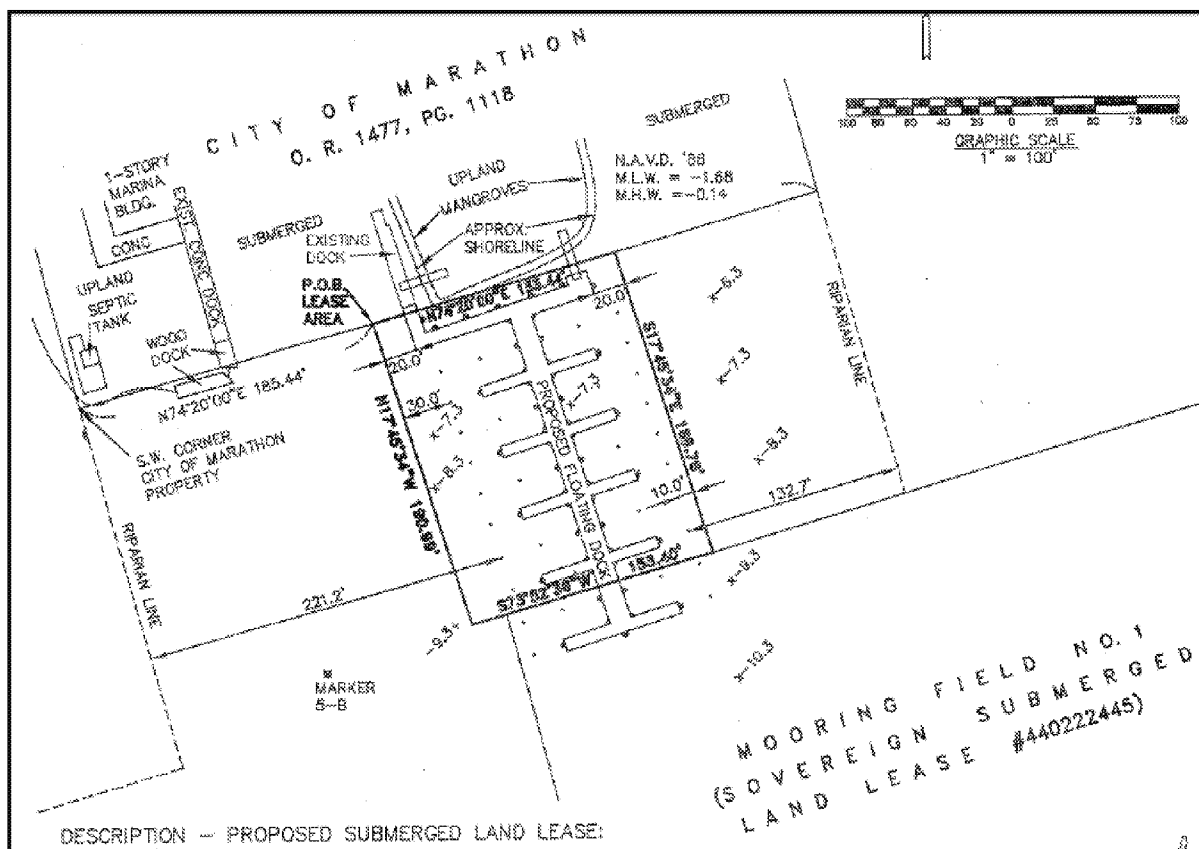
Example of Section 10 permit application with tidal datums and elevations referenced to NAVD88. (Jacksonville District)
